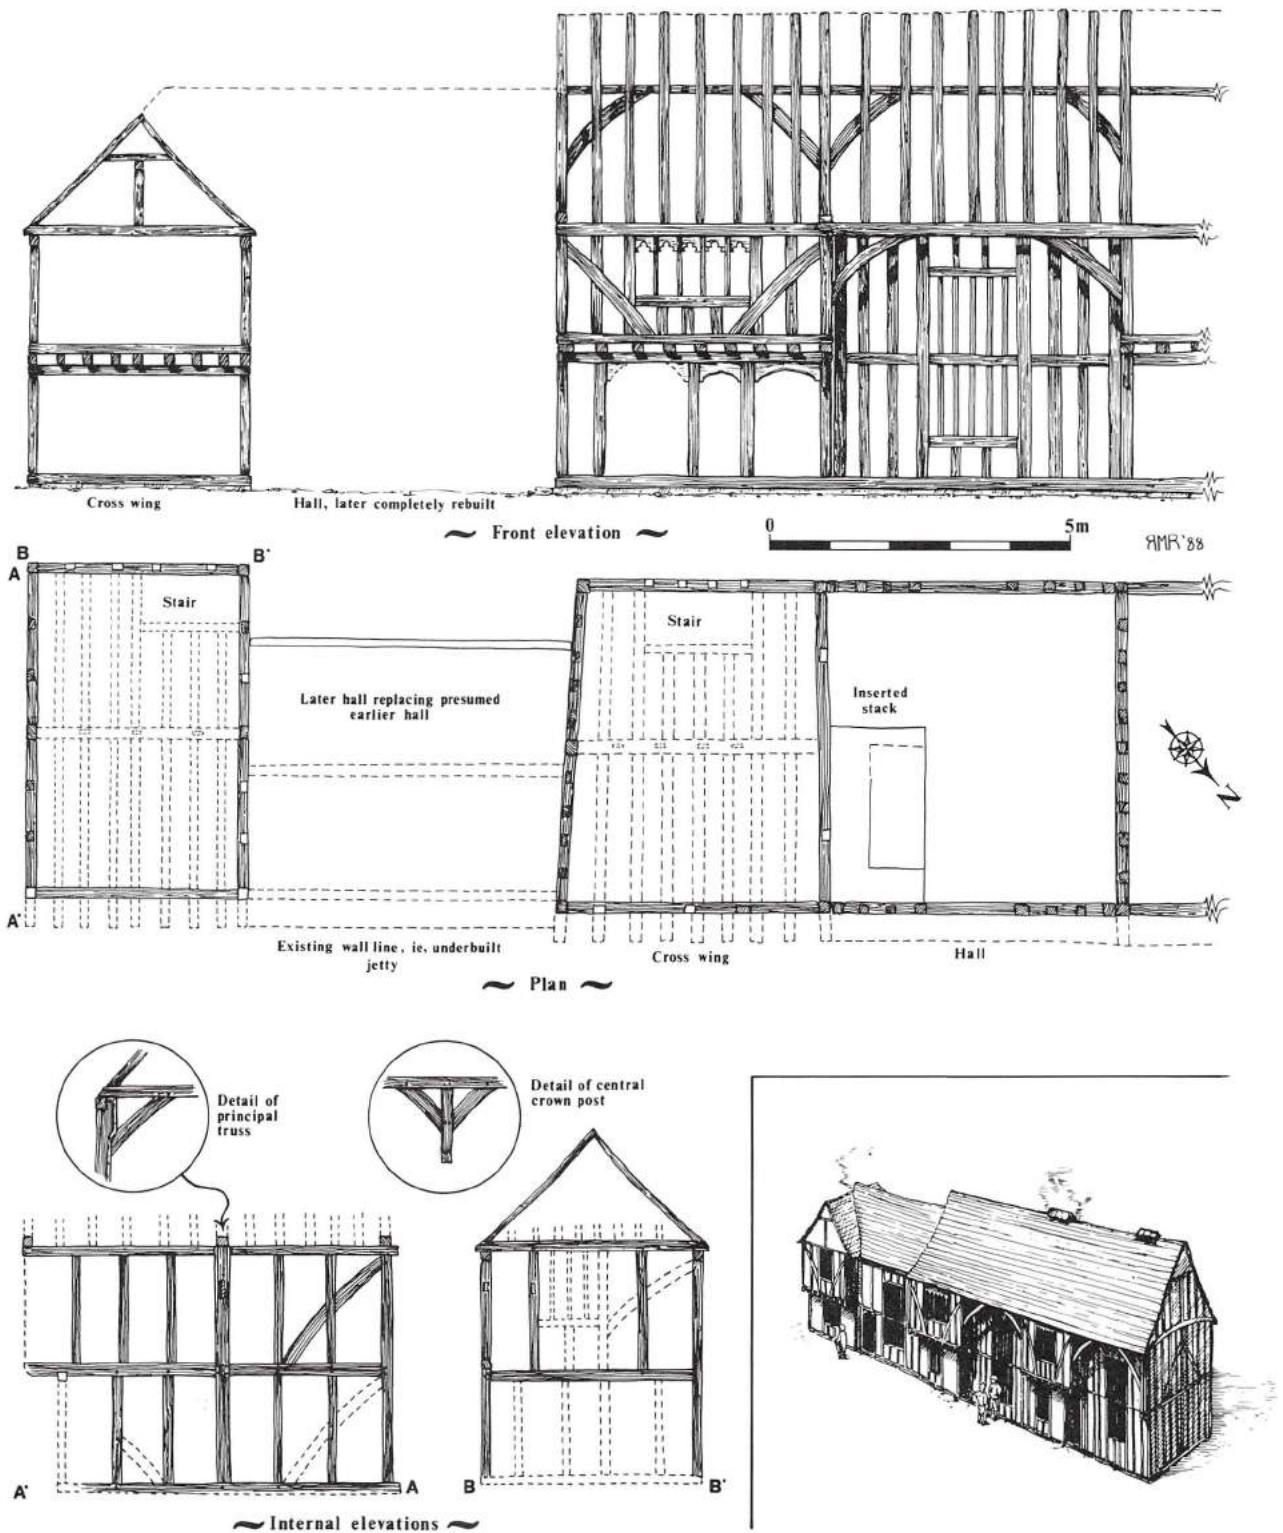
Plan and elevation of the cross-wing building and the southern Wealden
